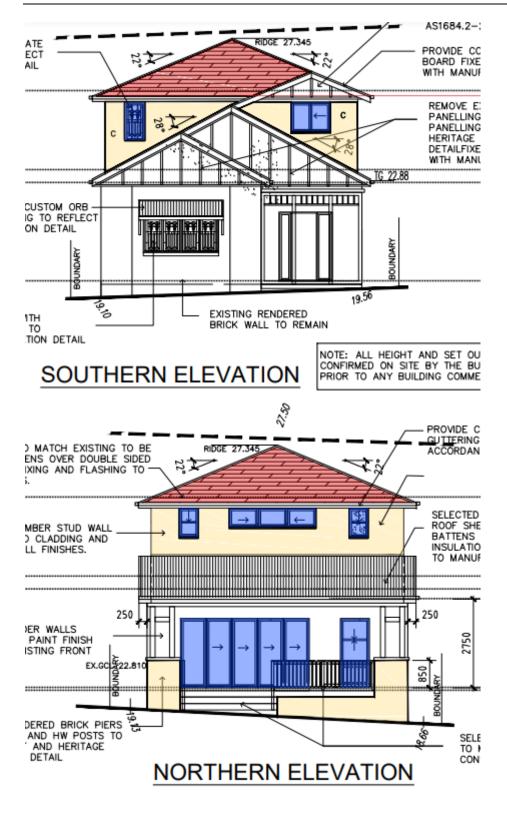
Proposed front and rear elevations (Source: Fedele Design P/L)
